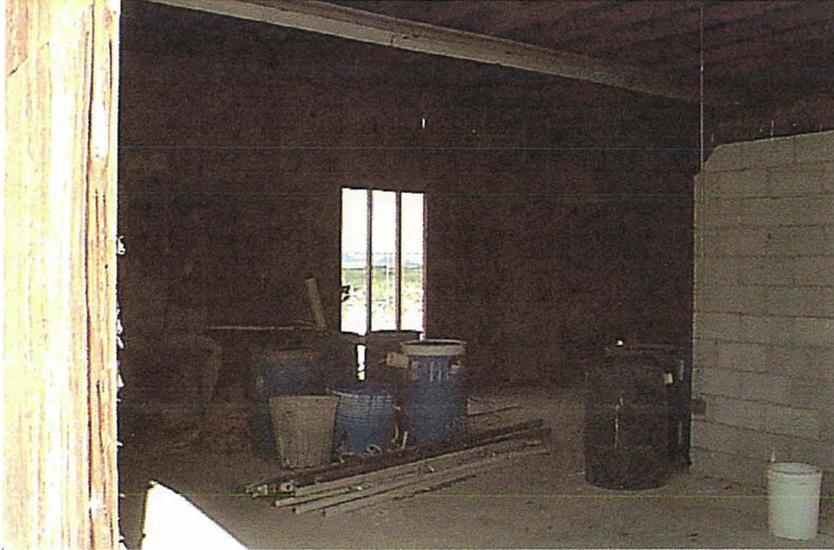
Taken by E. Seum on 4/18/00. Shows interior of small building in photo #44. Part of exterior wall missing.
